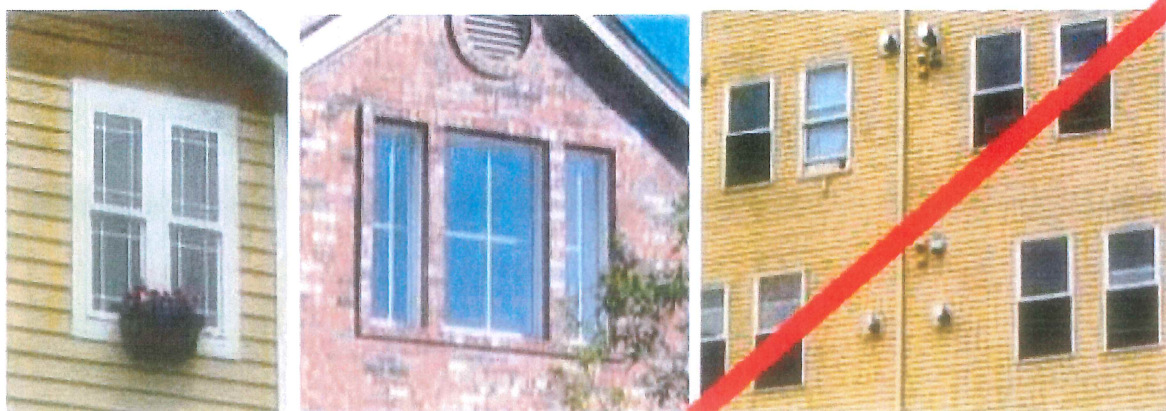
Acceptable (left and middle) and unacceptable (right) window design.
